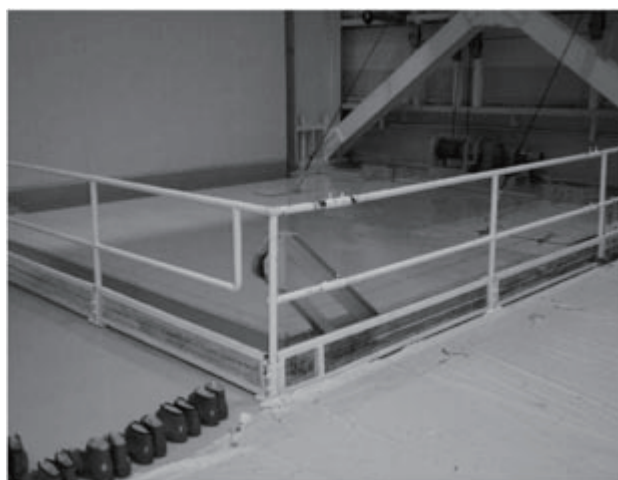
The steel lid of the equipment hatch on the 5<sup>th</sup> floor of the Unit 1 building.
